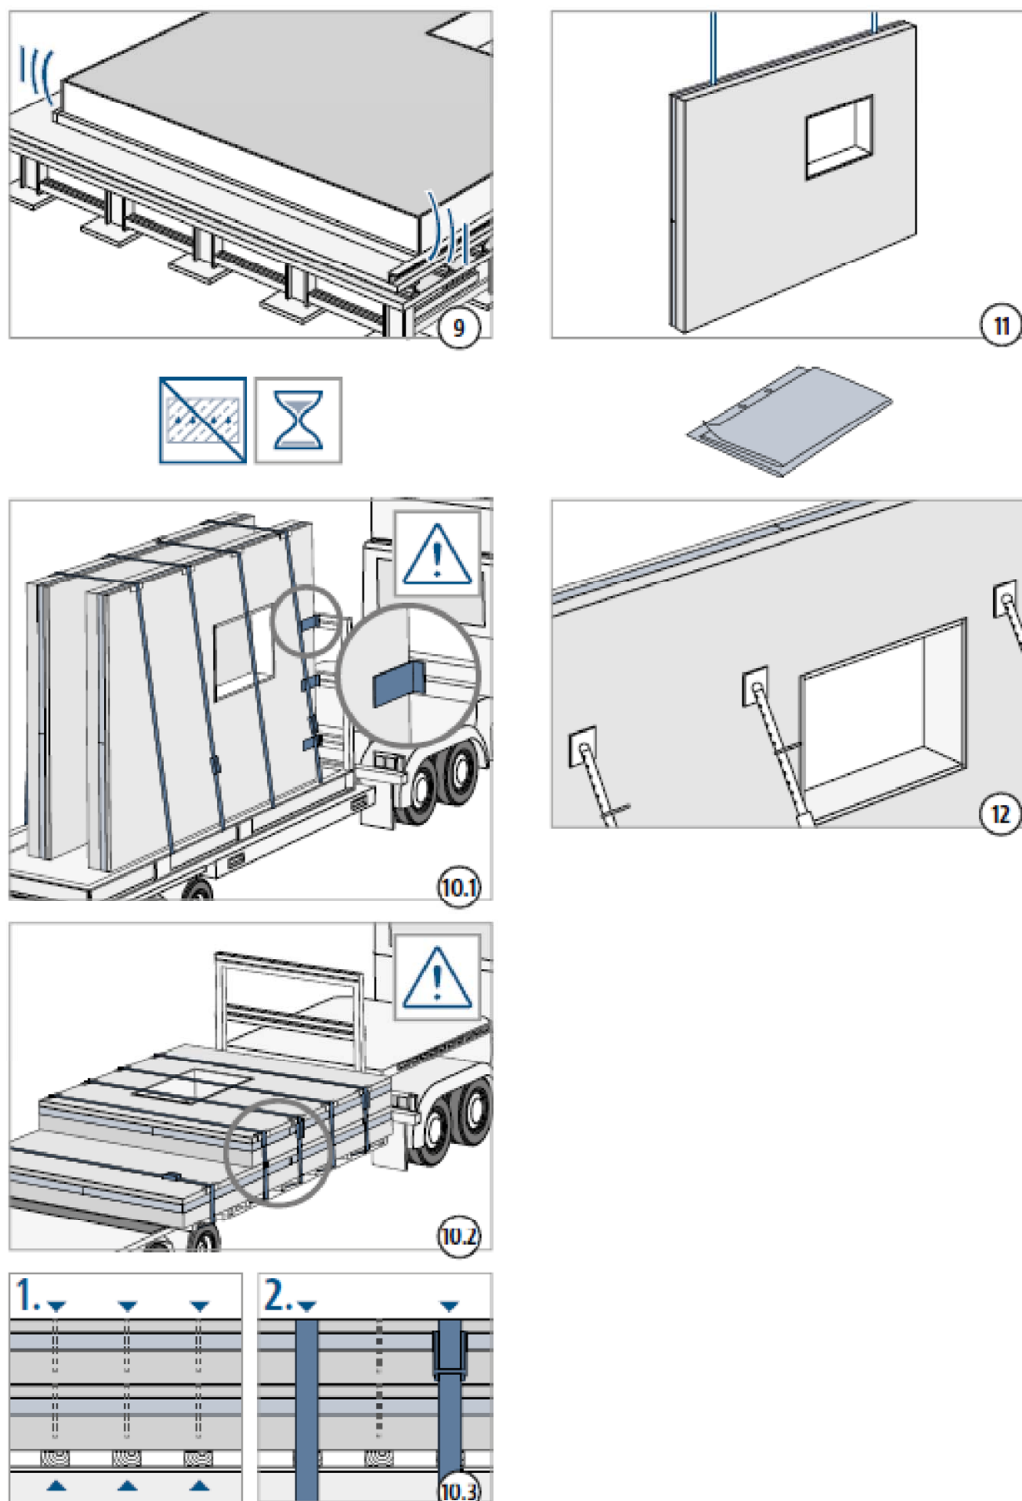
Installation instruction - Schöck Isolink® for sandwich wall – page 2
